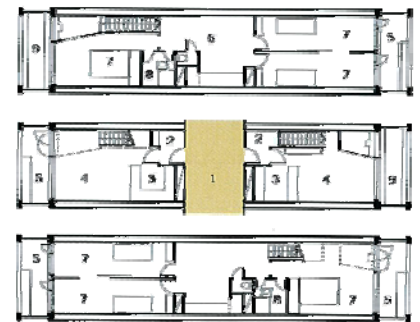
Unite D'habitation Floor plan - Largest split level apartment unit
